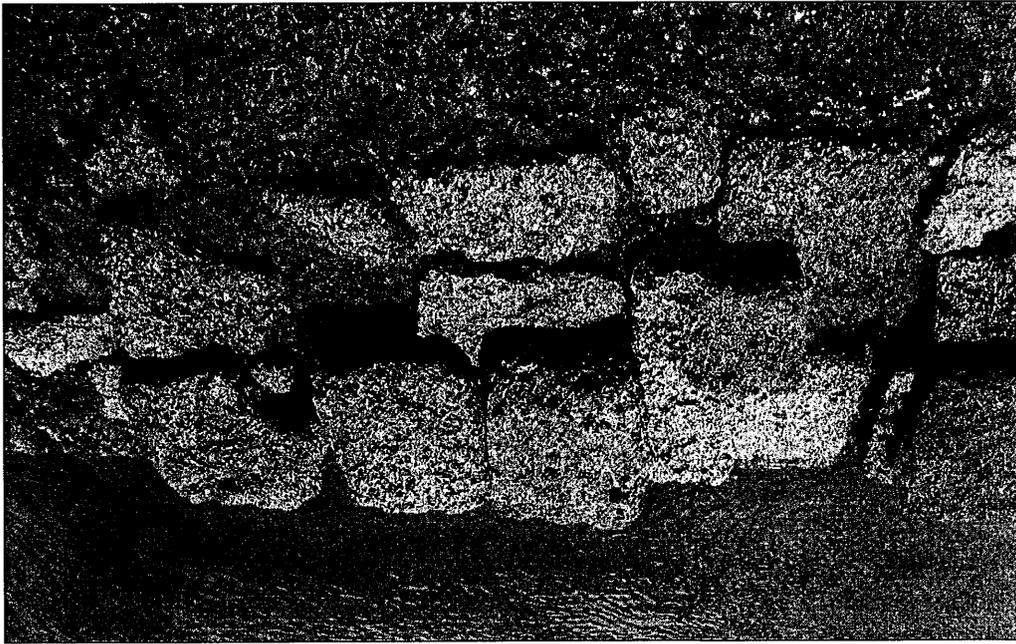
A Portion of the Coral Blocks Taken from Fort Kekuanohu to Construct a Sea Wall at Pier 12 (Looking South).
